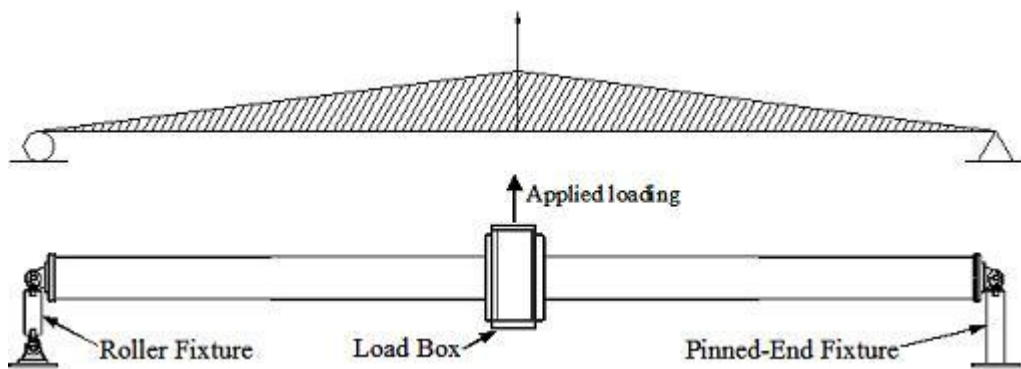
Test Setup Design with Simply Supported Beam Analogy [28]
